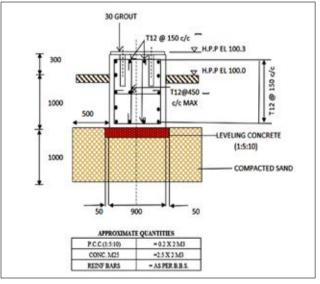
Elevation of Booster pump foundation (All dimensions are in mm)
